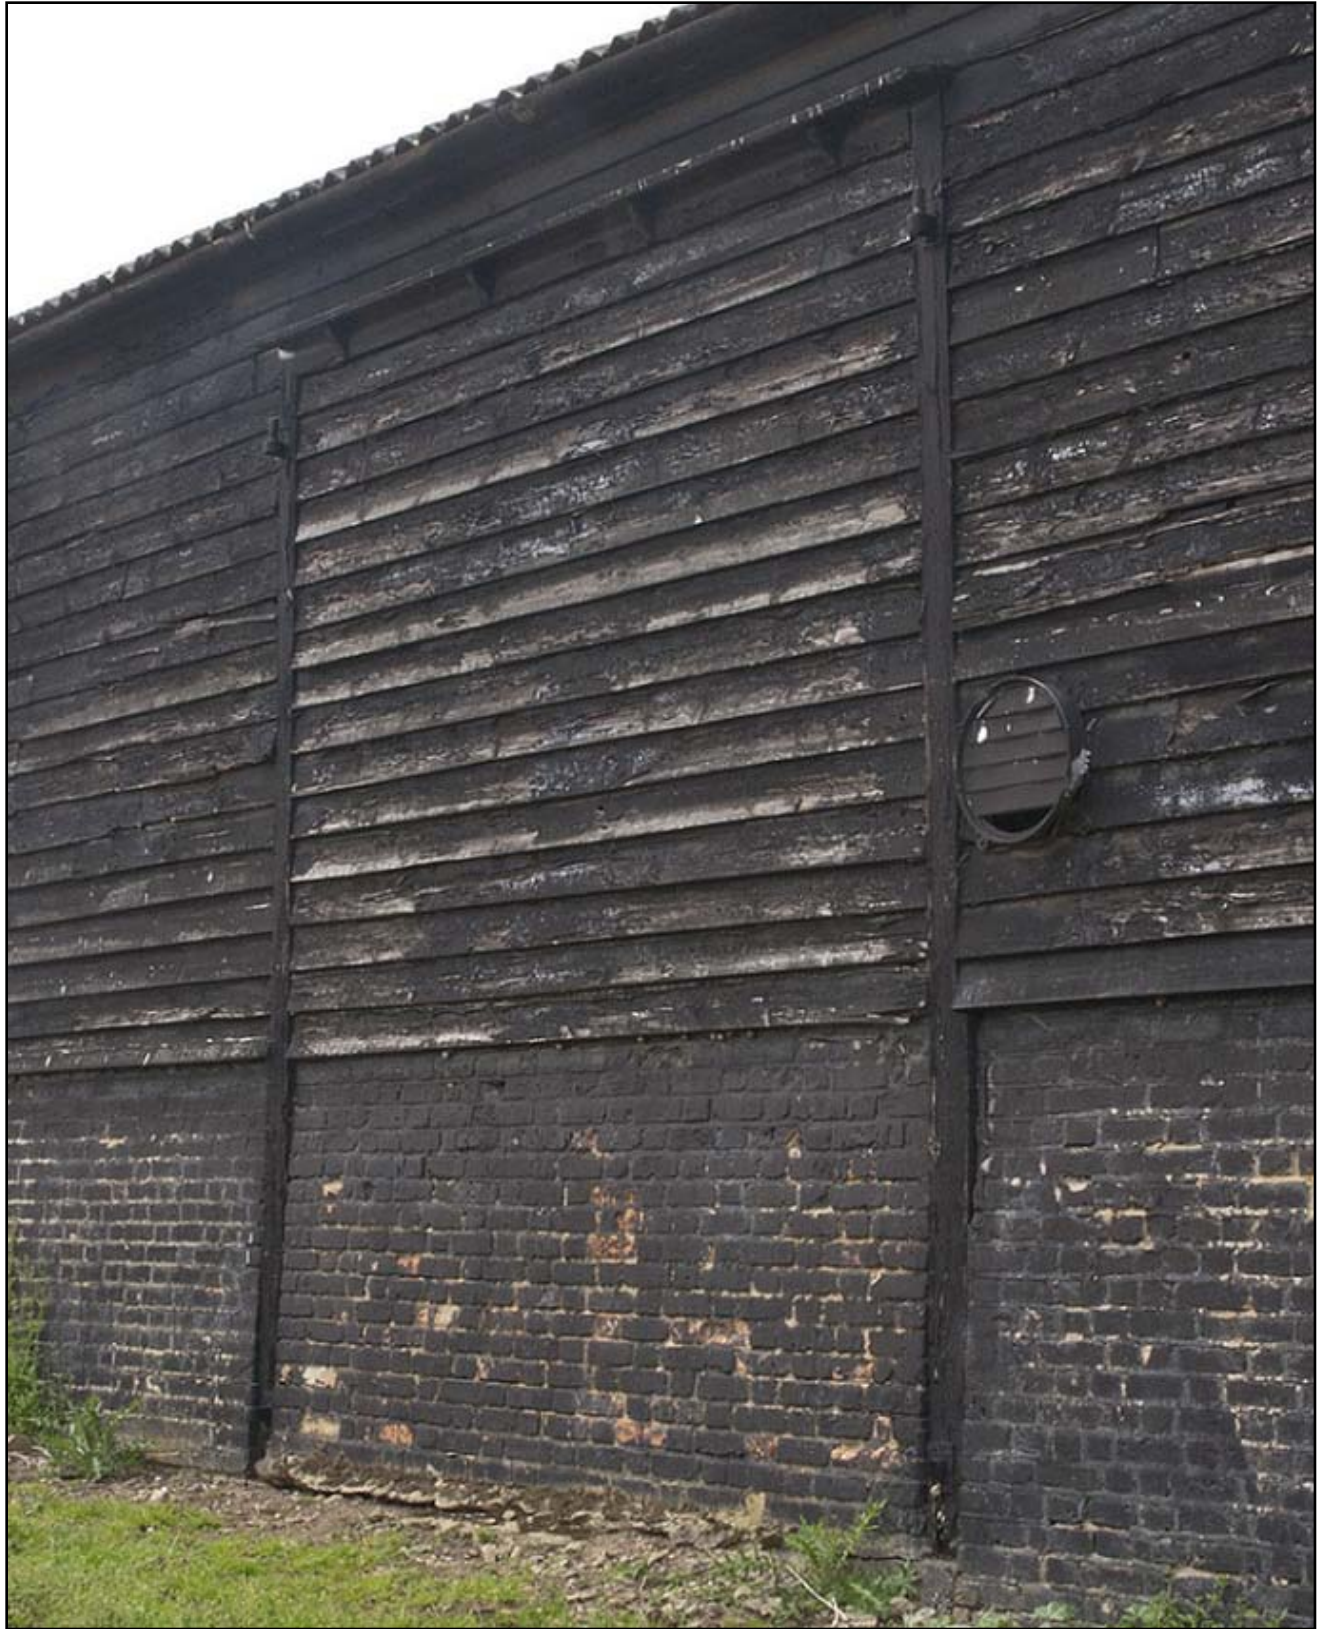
Infilled double door in the south elevation of Building 4, viewed from the south-east
